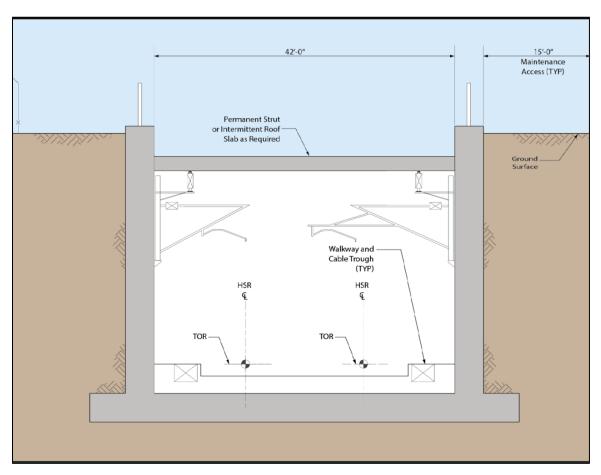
Typical High-Speed Rail Retained Cut/Trench Cross Section
